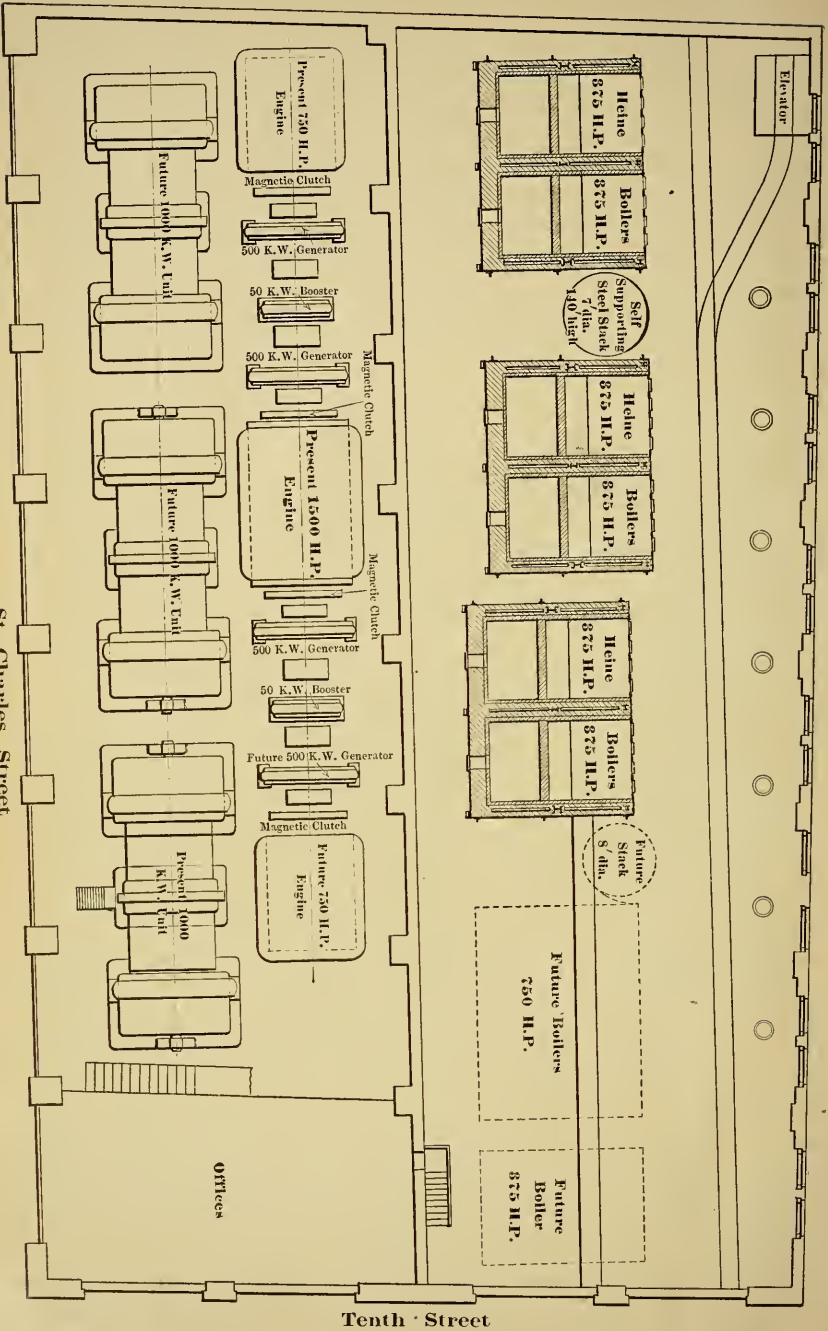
FLOOR PLAN OF BOILER AND ENGINE ROOM.
